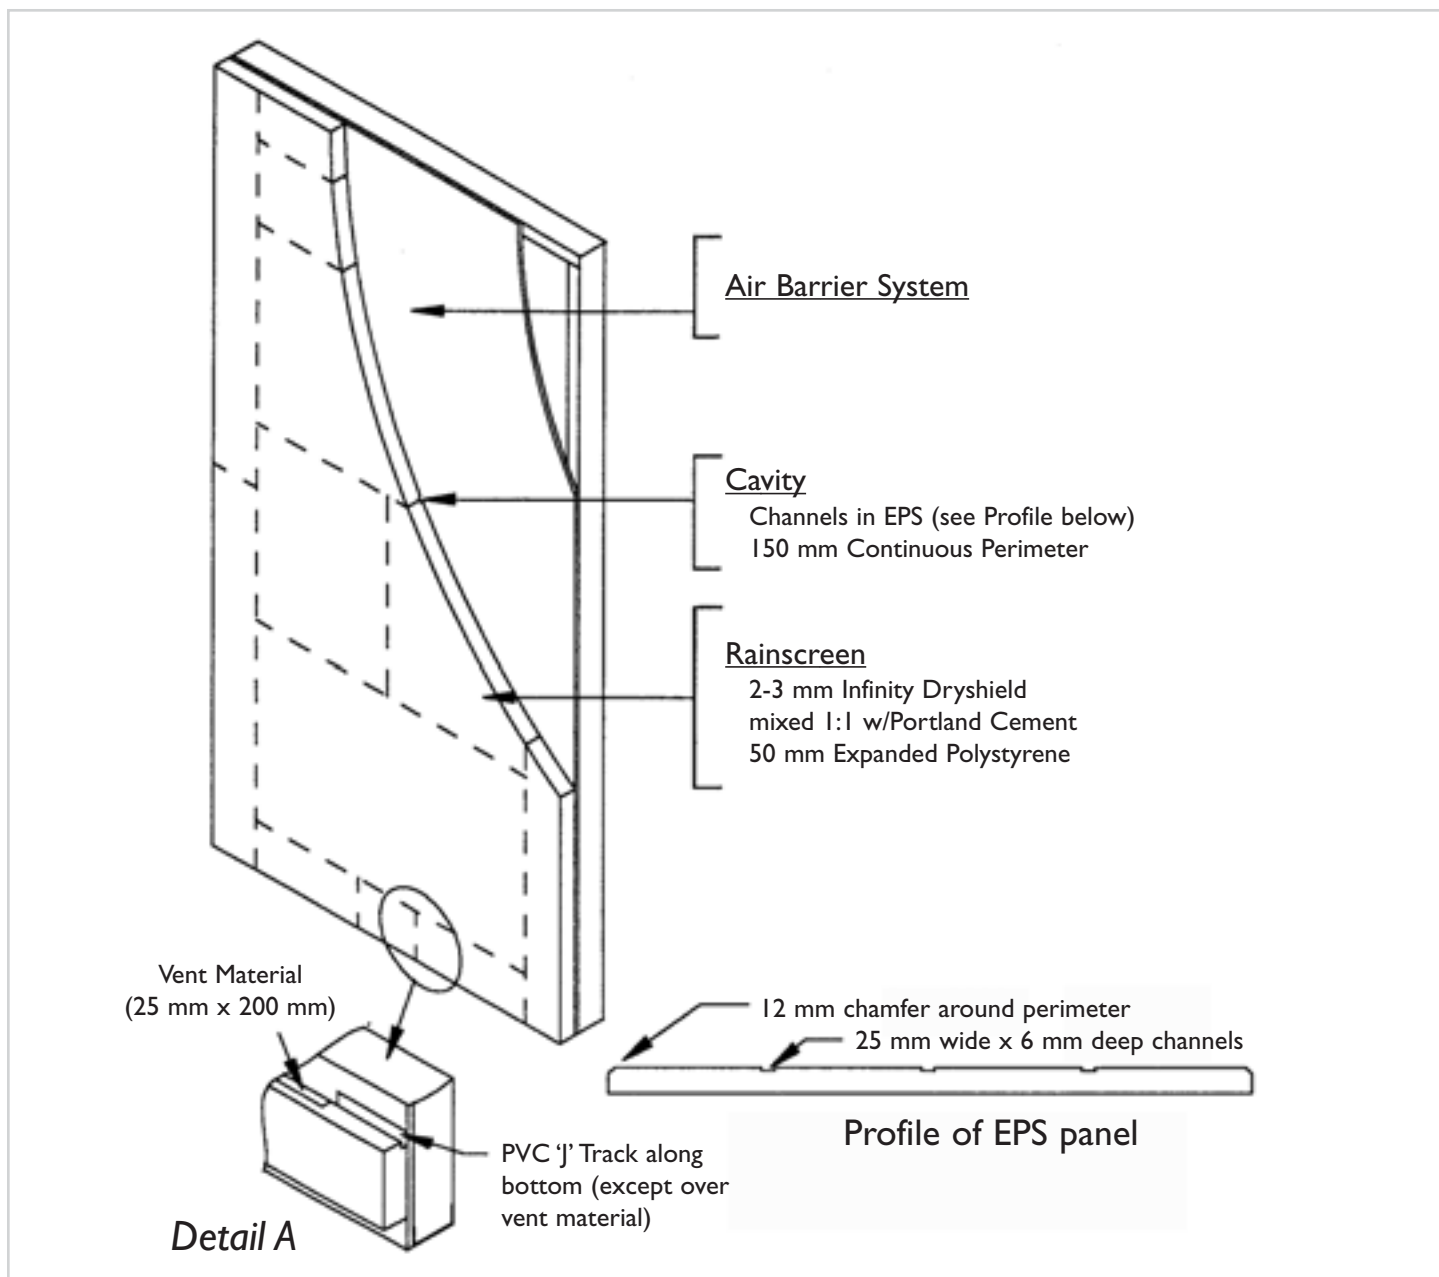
Details of construction of the exterior insulation and finish (EIFS) test specimens
